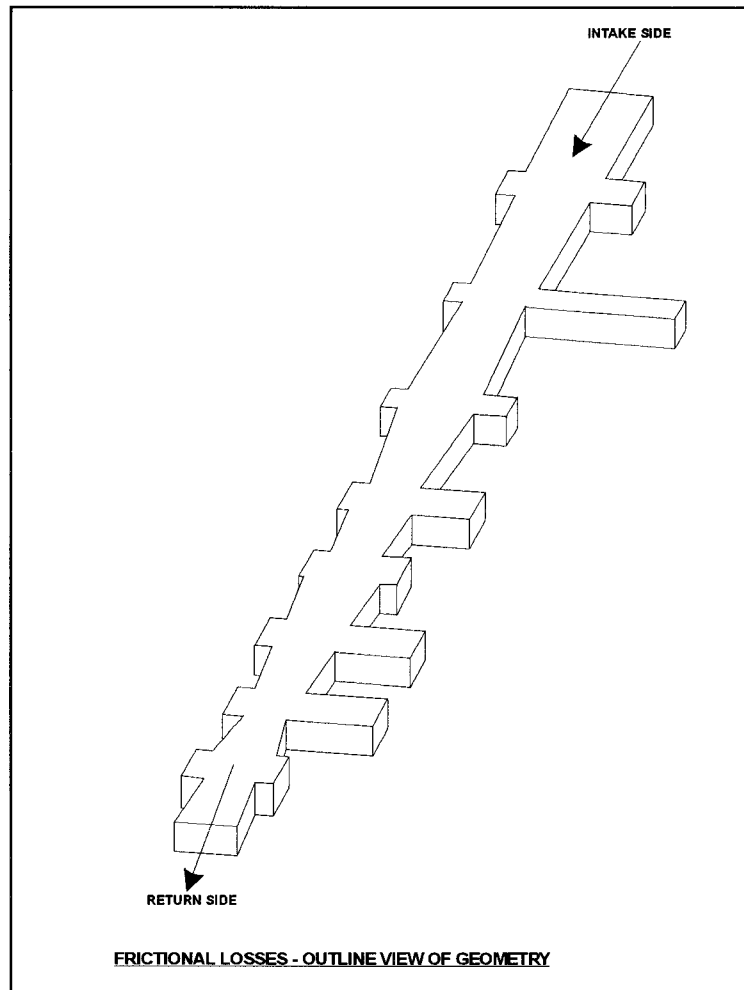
(a): Sketch showing the layout of the single return airway
